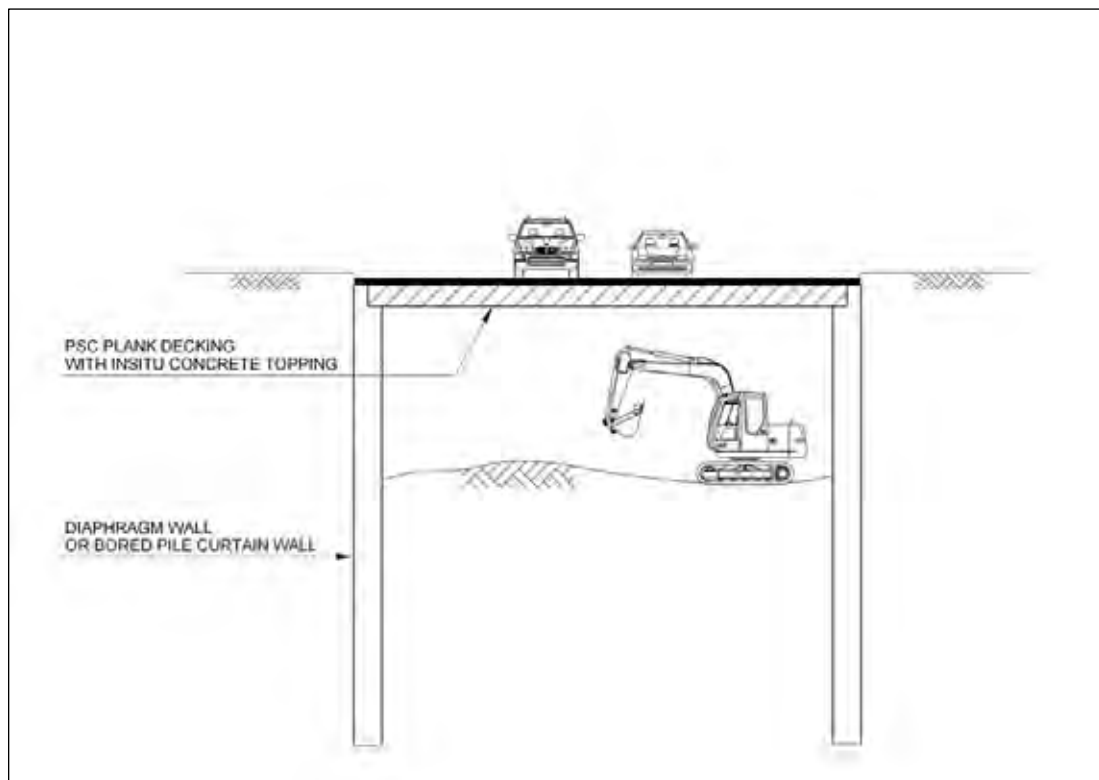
Cut and Cover Tunnel with PSC Plank
